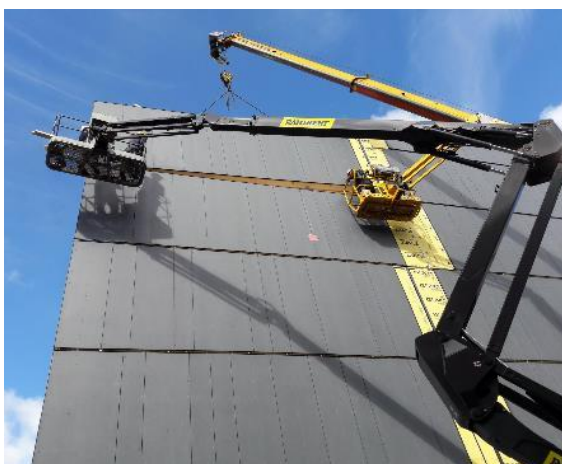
Installation of the wall module panels on the building site of the pilot building (May 2017)
